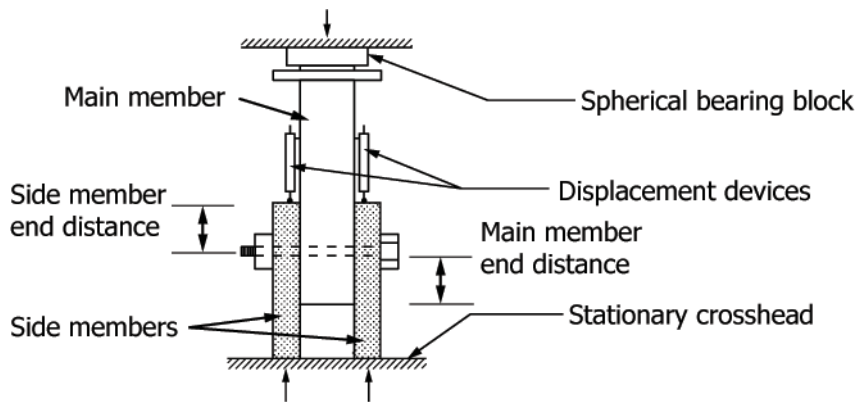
Assembly for Testing Single-Bolt Connections Parallel to Grain in Compression
